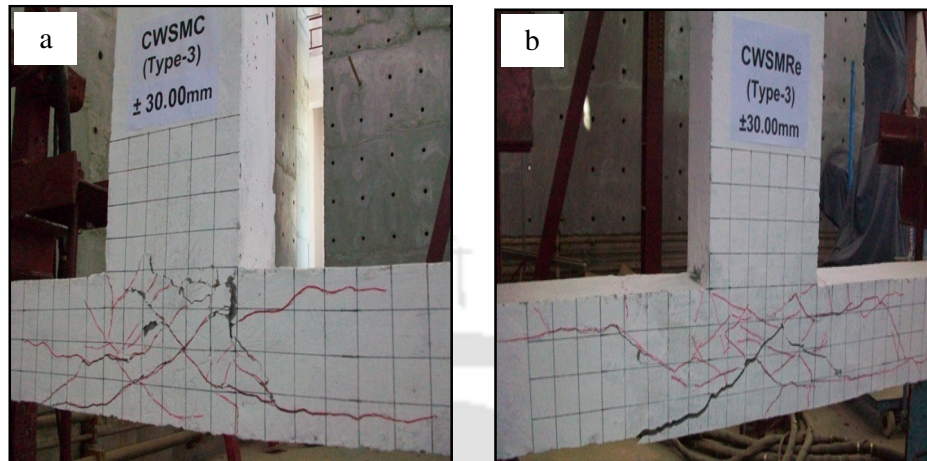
CWS specimens at the end of test under loading type-3:
